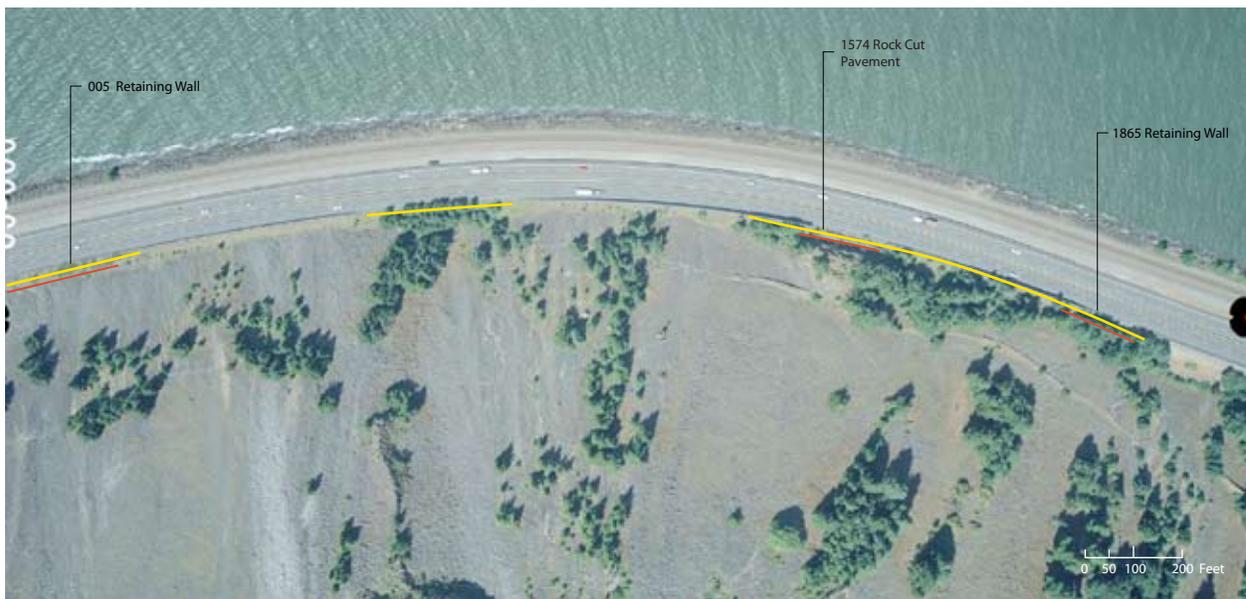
Shellrock Mountain, center section, 2003 aerial photograph.
